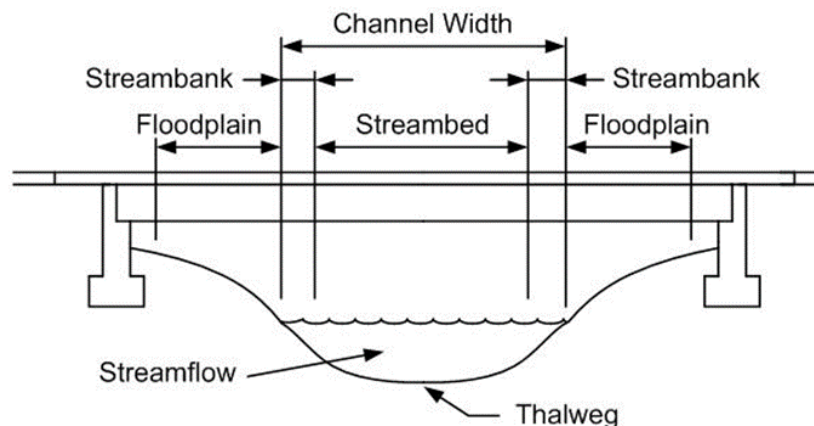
Typical Waterway Cross Section Showing Well Defined Channel Depression
